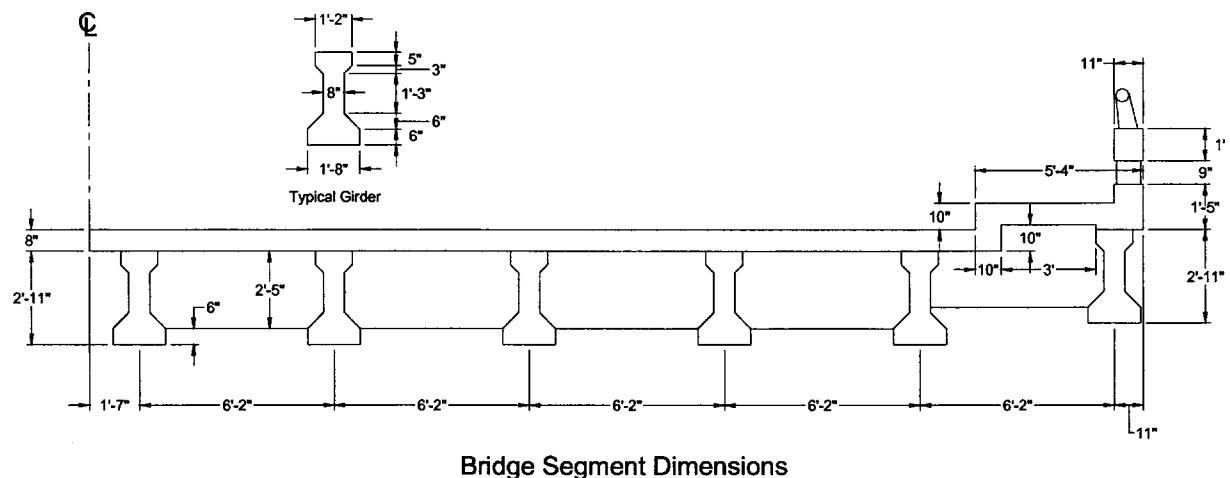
Cross-section details of US 90 highway bridge over Biloxi Bay (1 ft=0.3048 m)
